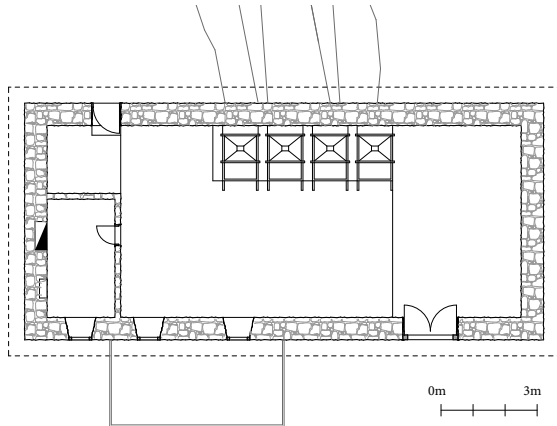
(right) Floor plan, Mill of Sallaj Family, Junik
